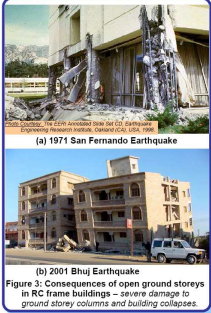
Consequences of open ground storeys in RC frame buildings – severe damage to ground storey columns and building collapses.
